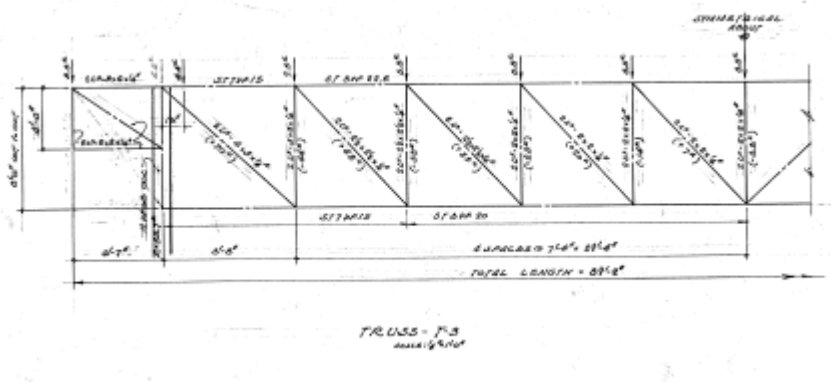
Truss T-3 Profile from CFAC Roof 4.
